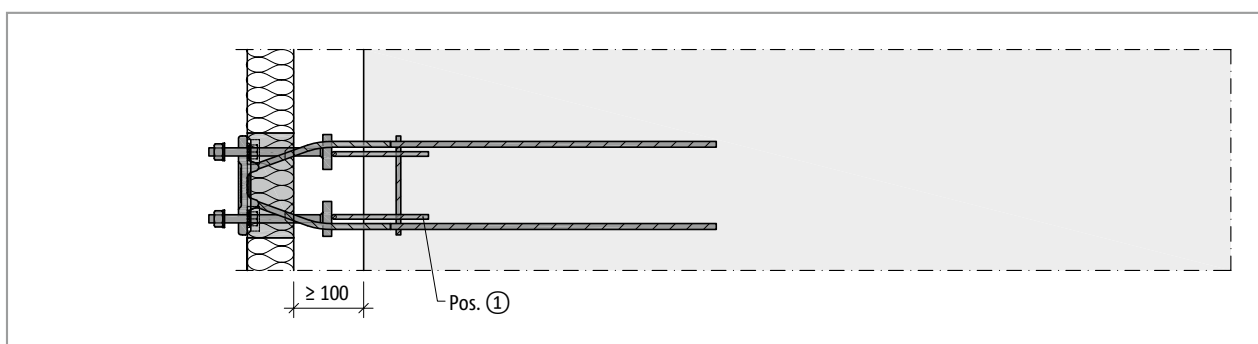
Schöck Isokorb® T type SQ: On-site reinforcement for semi-precast construction: Plan view
